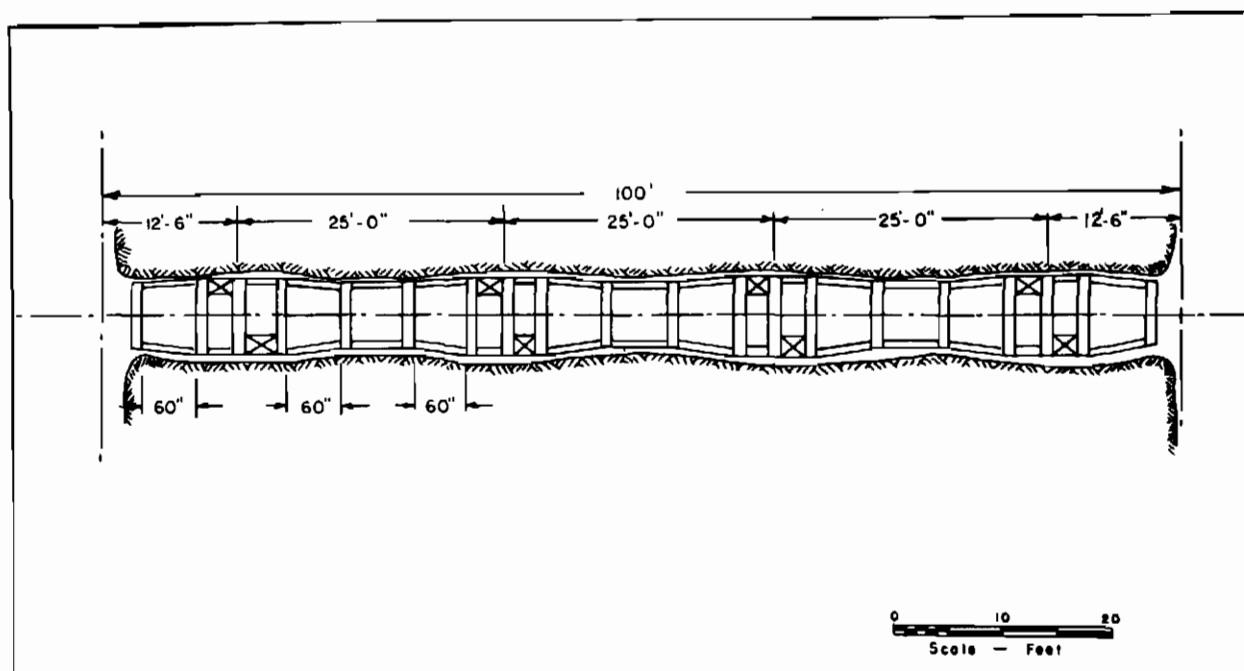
Plan of Chute and Intermediate Sets on Haulage Level.
